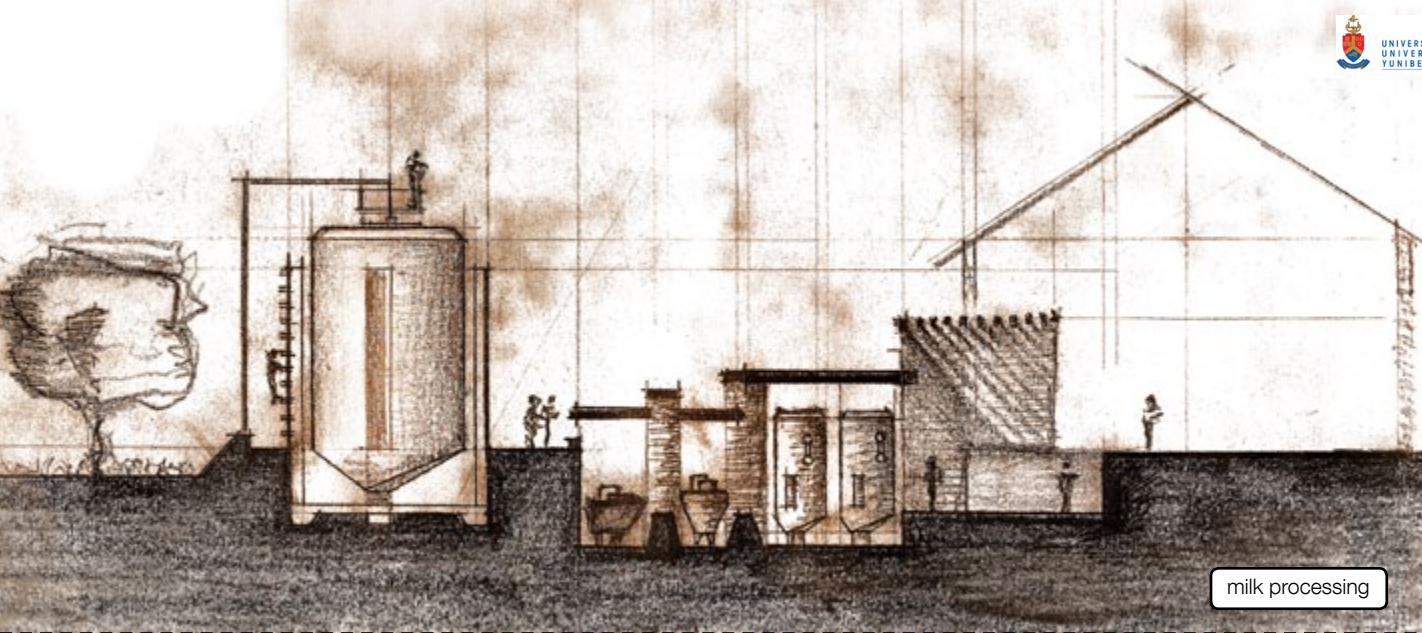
Layout of the proposed building functions and connections (Author: 2012)
